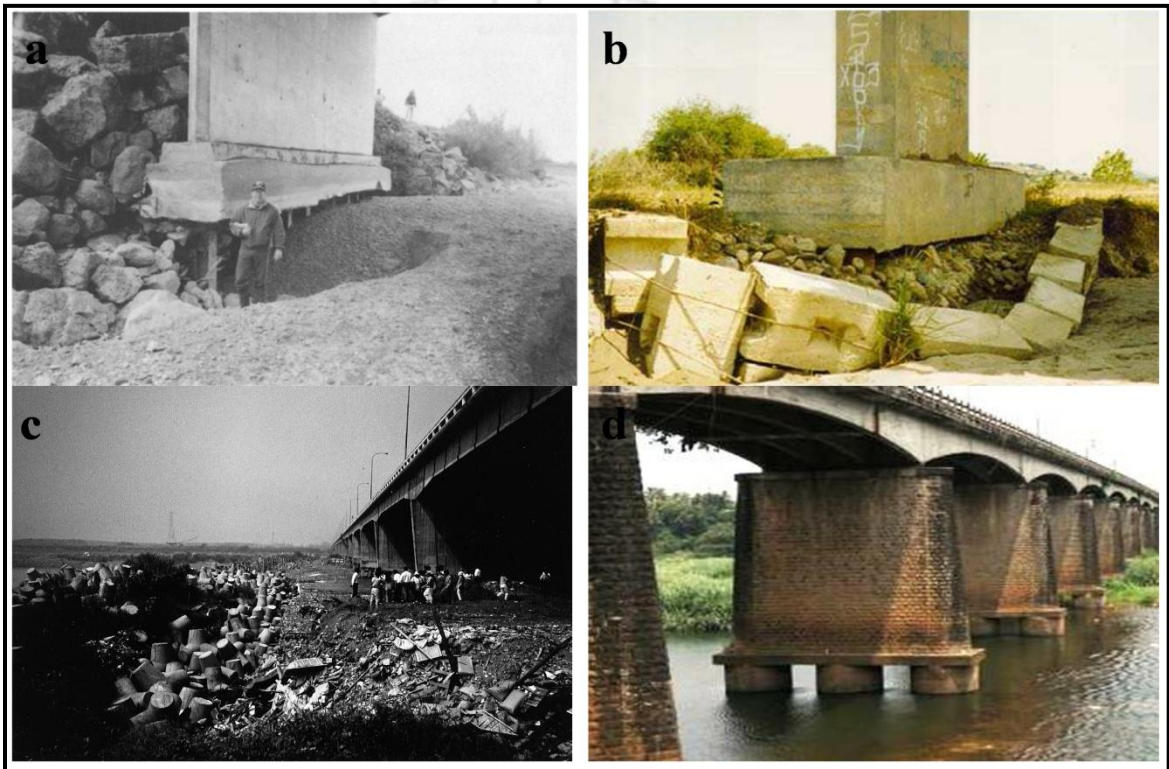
(a) Undermining of Highway 32 Bridge, over Stony creek, near Orland, California due to incision up to 5 meters (Kondolf, 1994) (b) Undermining and failure of scour protection work around pier 5 of Cienega Road Bridge (Avila, 2006) (c) Undercutting and grade control efforts along the downstream side of the Kaoping Bridge over the Kaoping River, Taiwan, to control incision caused by massive gravel mining downstream (Kondolf, 1997) (d) Exposed foundations of Periyar Bridge in Tamil Nadu, India after intensive sand mining activities in the proximity (image downloaded from <https://timesofindia.indiatimes.com>).
